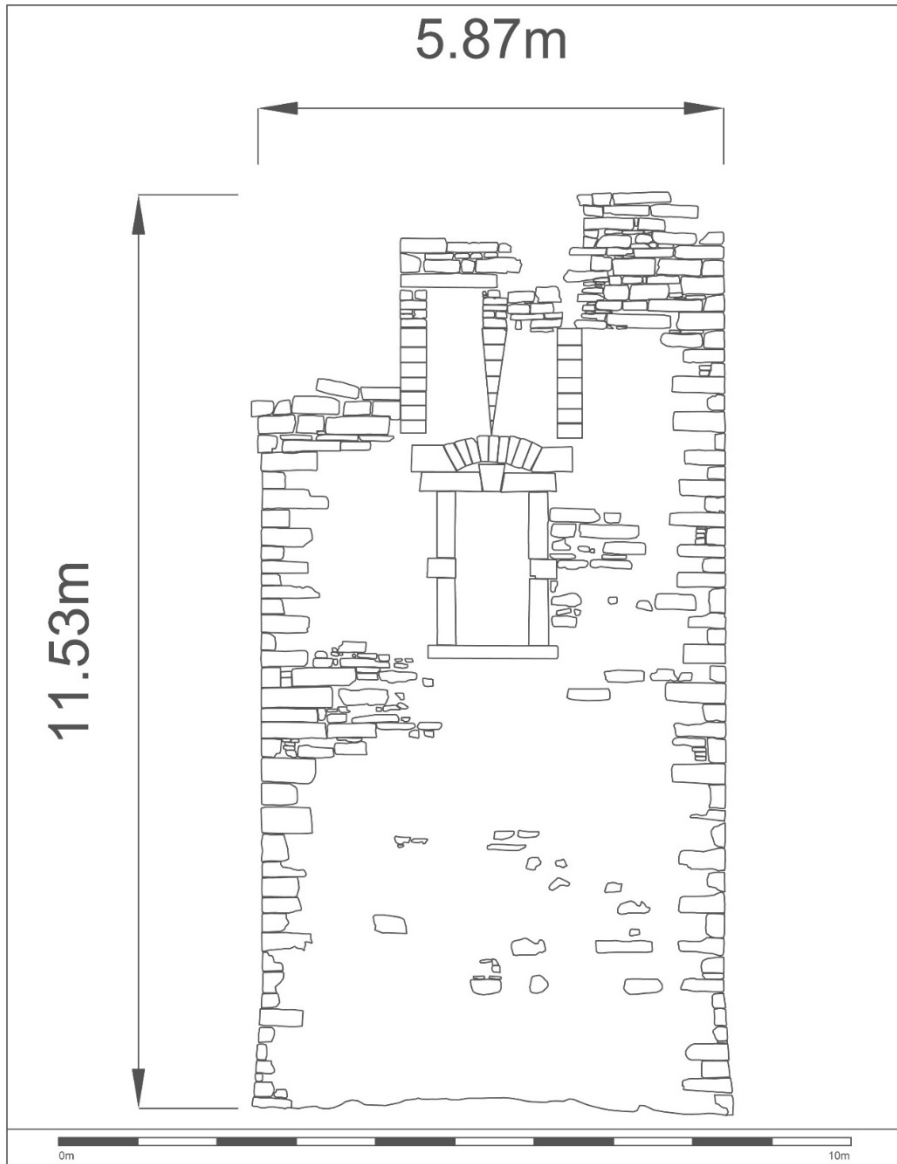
External elevation of the north-west wall of Glen Head Signal Tower.
